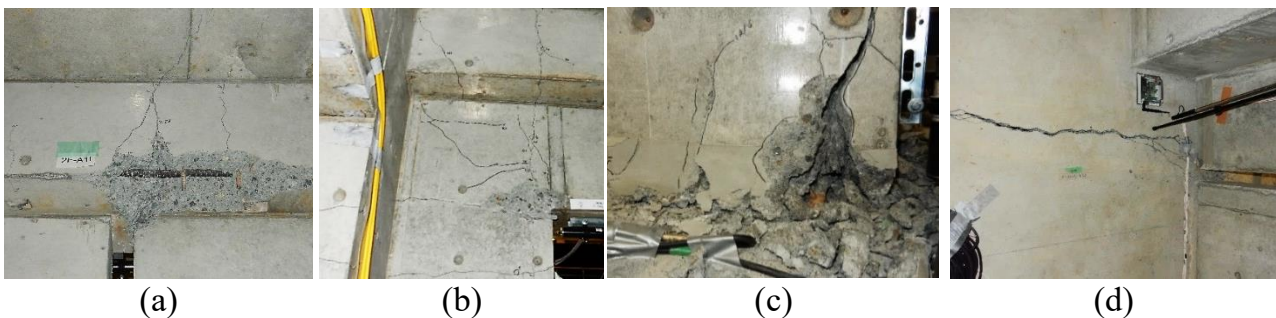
Damage observation photos (after 150-1); (a) 2F beam, (b) 3F beam, (c) column base, (d) slab
